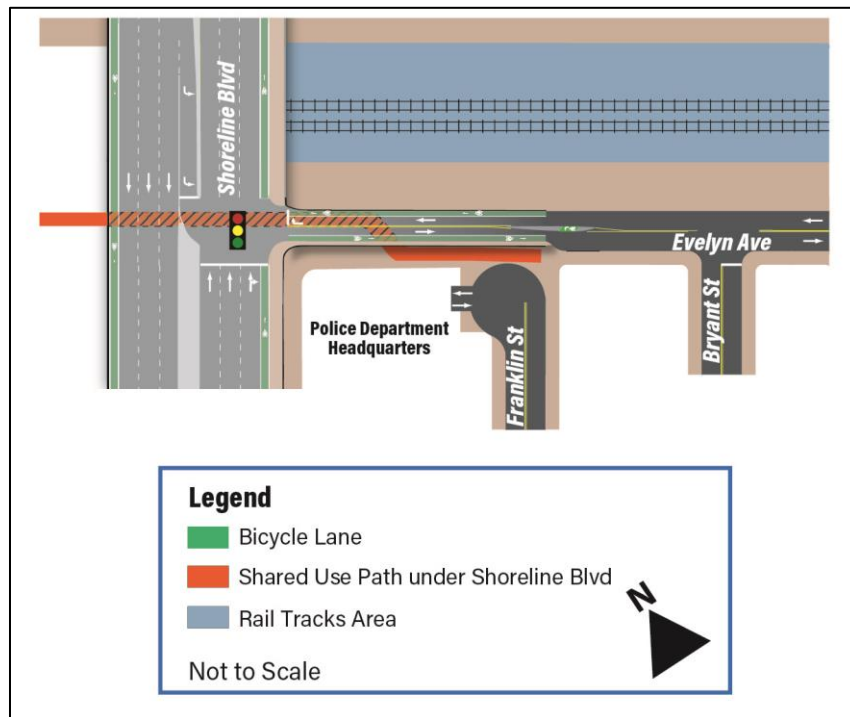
Evelyn Avenue Ramp to Shoreline Boulevard – Aerial View
